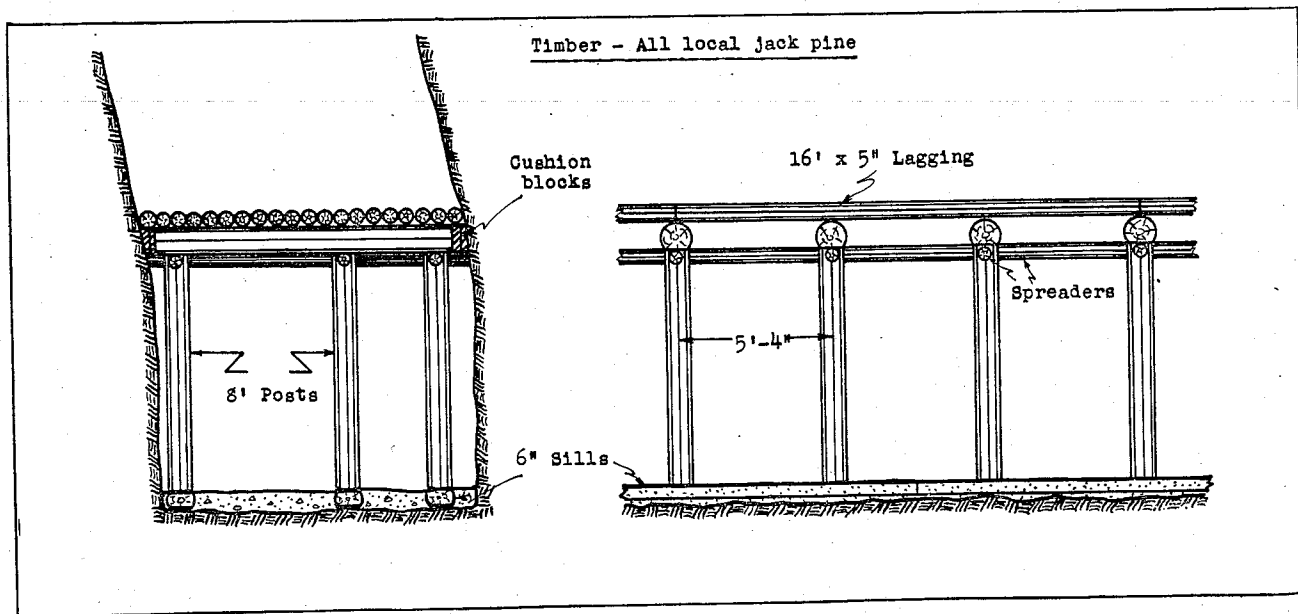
Stope Drift Timbering when floor pillar has not been extracted.
